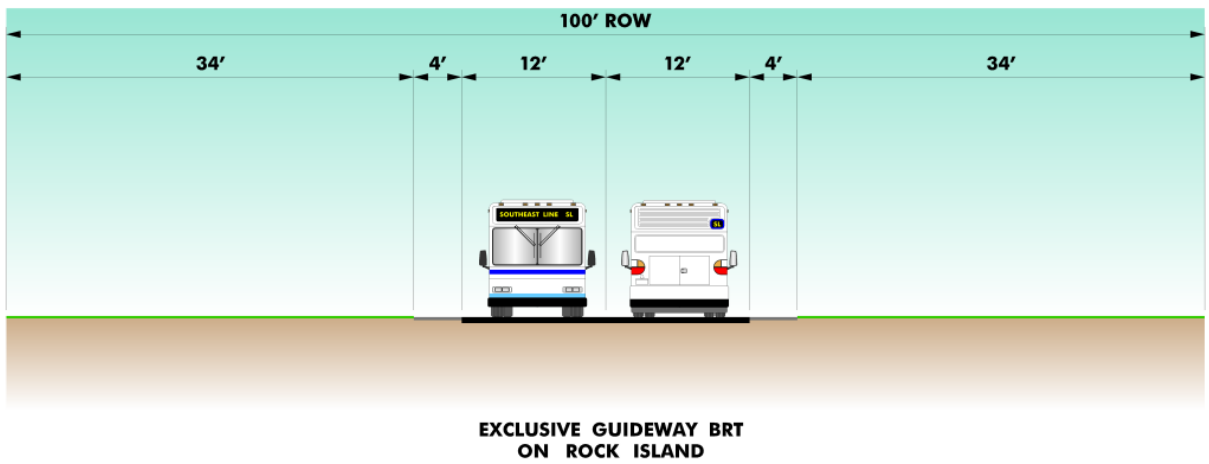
Bus Rapid Transit Rock Island Railroad Typical Section
